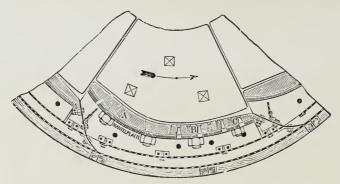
Method of securing Armour Plates to Skin Plates.
